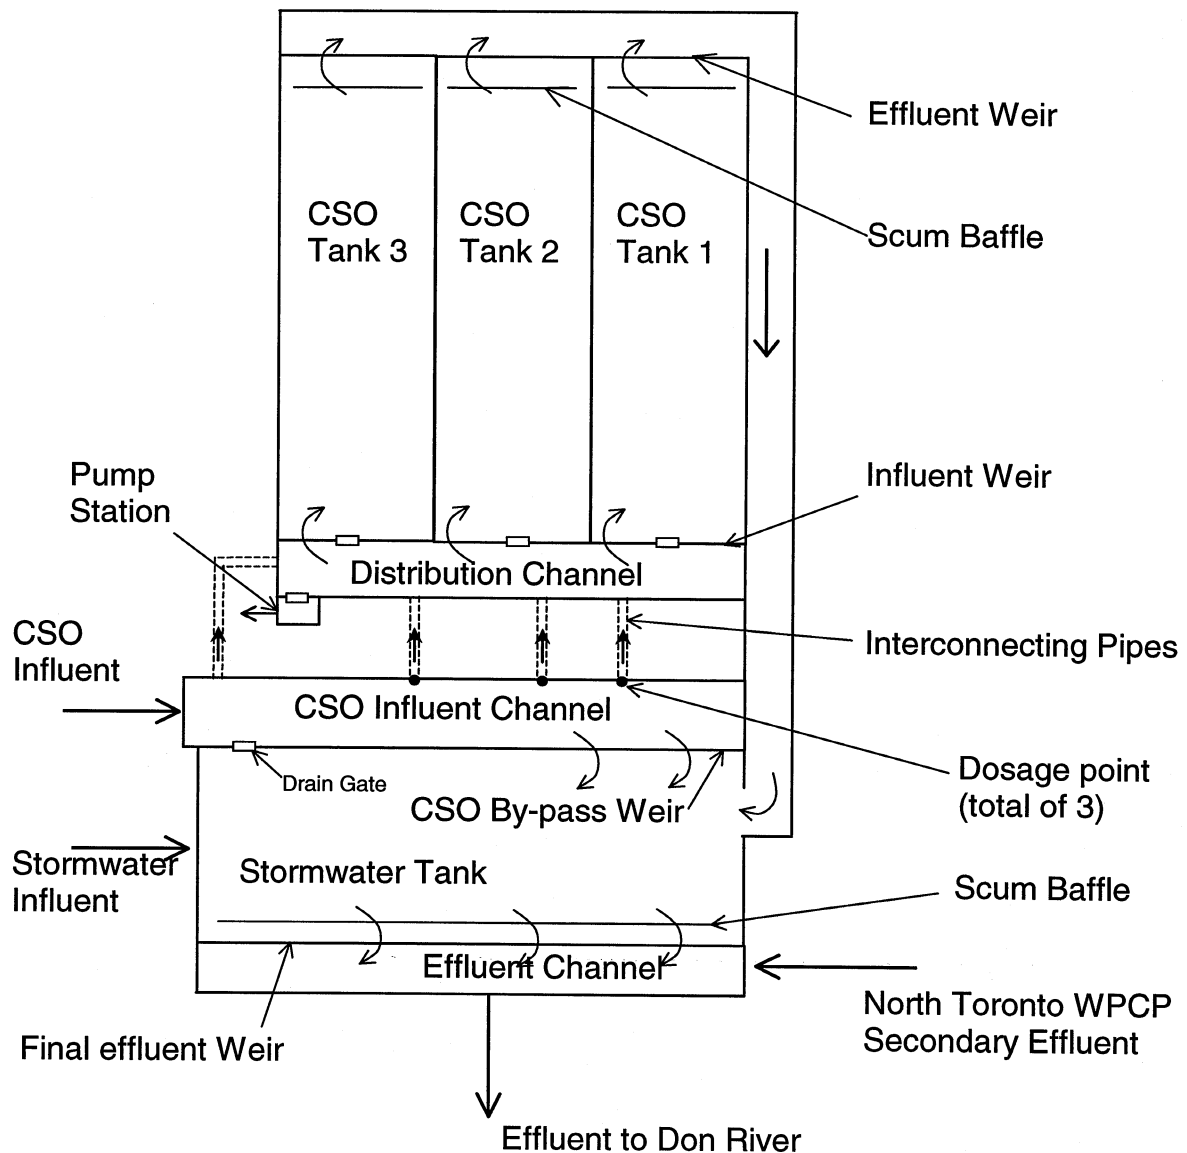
Plan sketch of the North Toronto CSO. Ola Lagerkvist.
